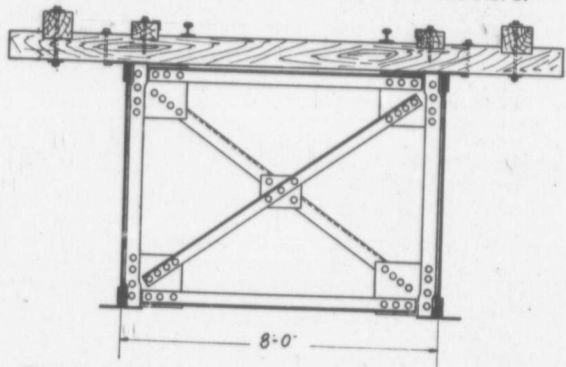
Typical cross section of a Deck Plate Girder Span.
